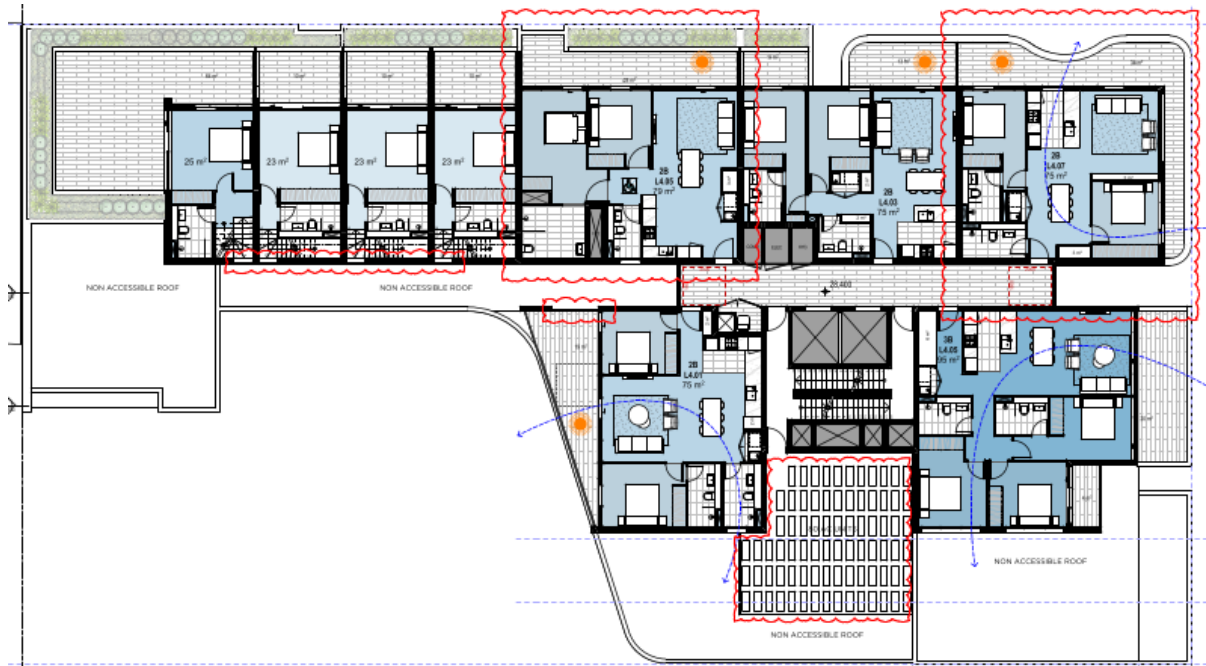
Extract of the approved floor plan of Level 4 in DA2016/170/2.
